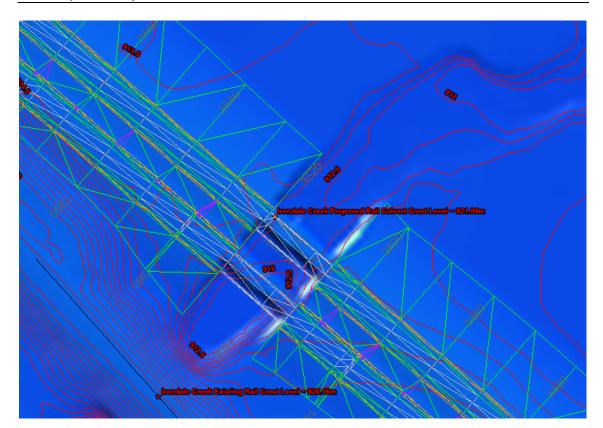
Irondale Creek proposed Rail Culvert (existing channel 0.5m contours in red).
